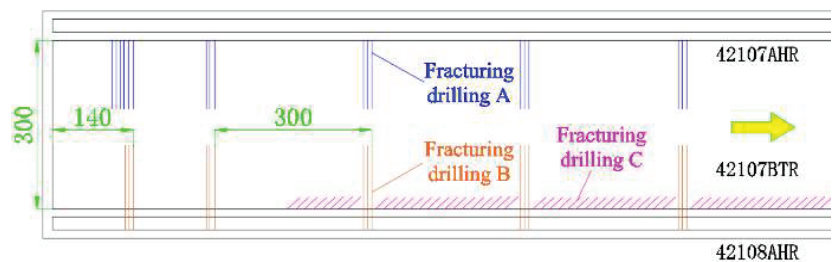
Hydraulic fracturing drill layout plan of hydraulic fracture drill holes.
